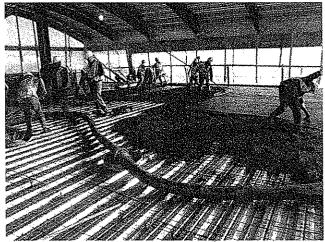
Placing concrete on the 4<sup>th</sup> floor of building segment E. January 6, 2011.
